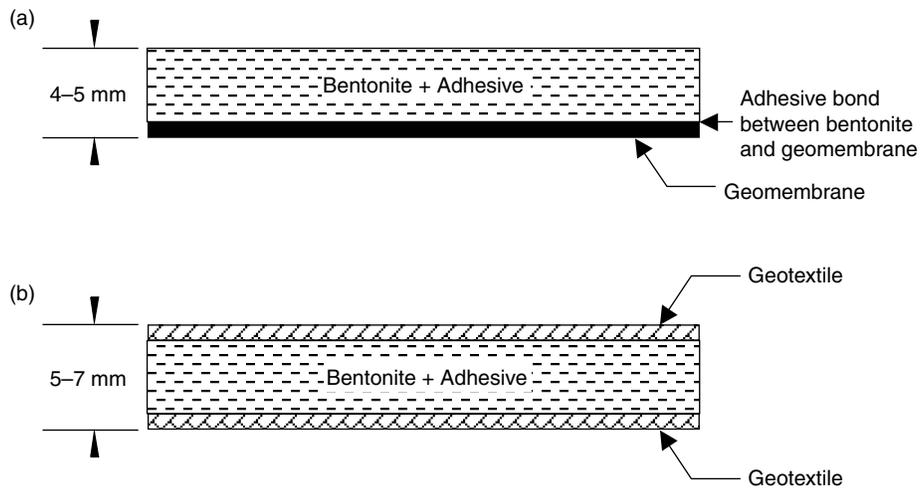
GCL configurations: (a) bentonite glued to a geomembrane; (b) bentonite sandwiched between two geotextiles.
